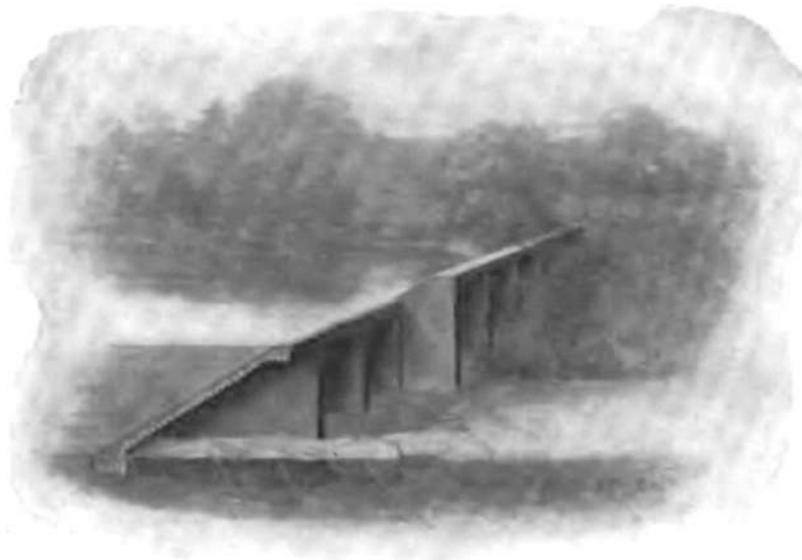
SECTION OF CONCRETE-STEEL DAM FOR MODERATE HEAD AND LEDGE FOUNDATION.
